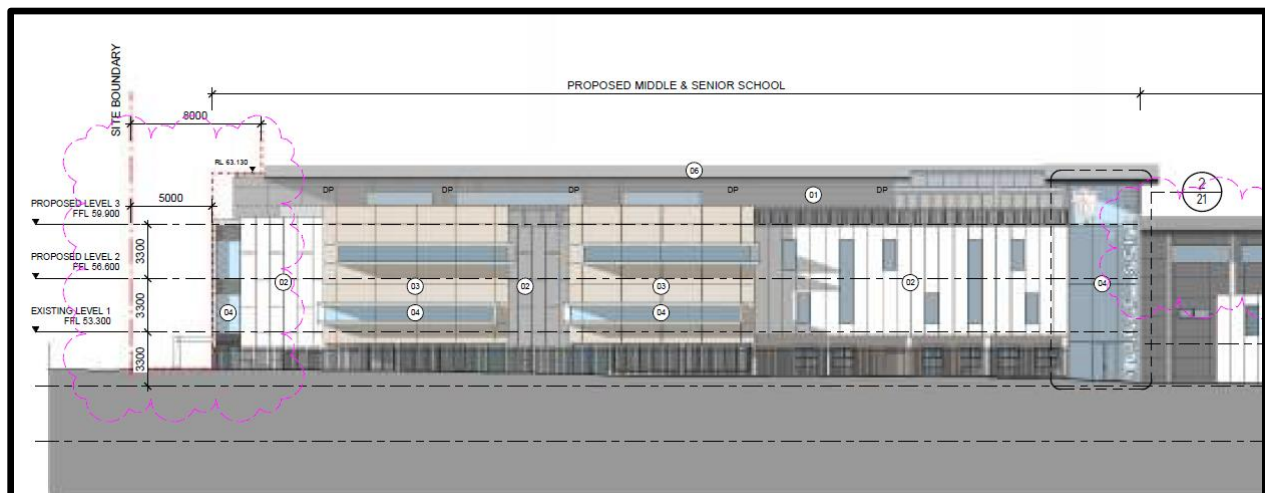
Rear elevation of the new building as viewed from Bogie Lane Allawah.
